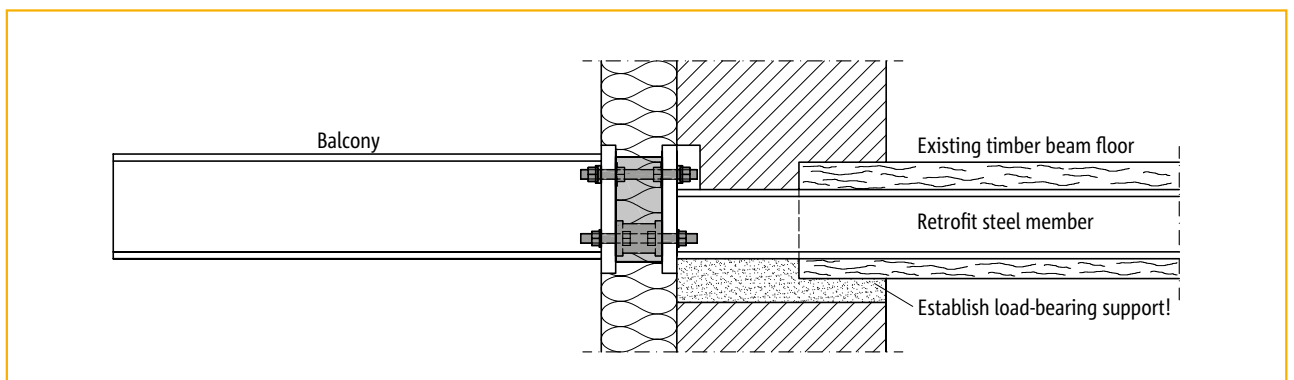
Balcony freely cantilevered, connected with type KST on timber balcony floor (steel balcony)
